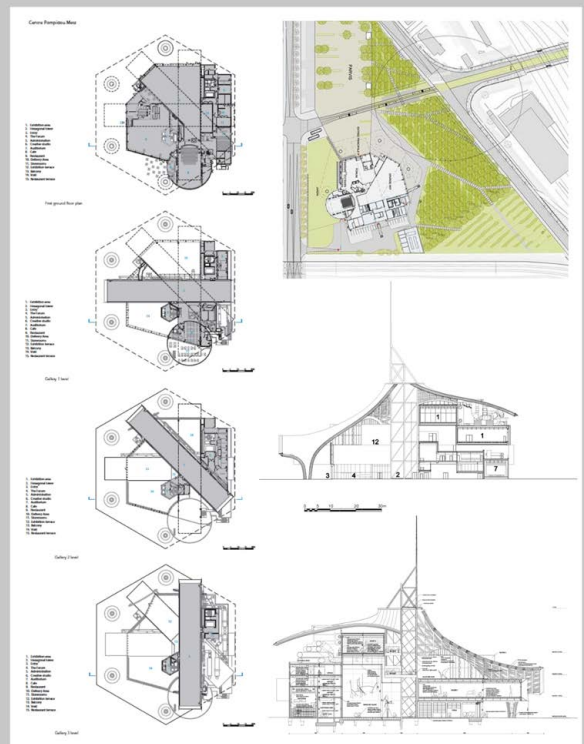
Shigeru Ban Architects' Centre Pompidou - collection of drawings. Collected and layout by the authors.
